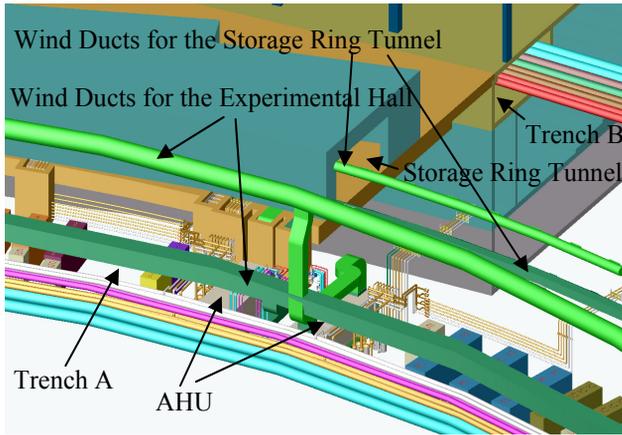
Layout of the storage ring tunnel and technical trenches of the TPS.
